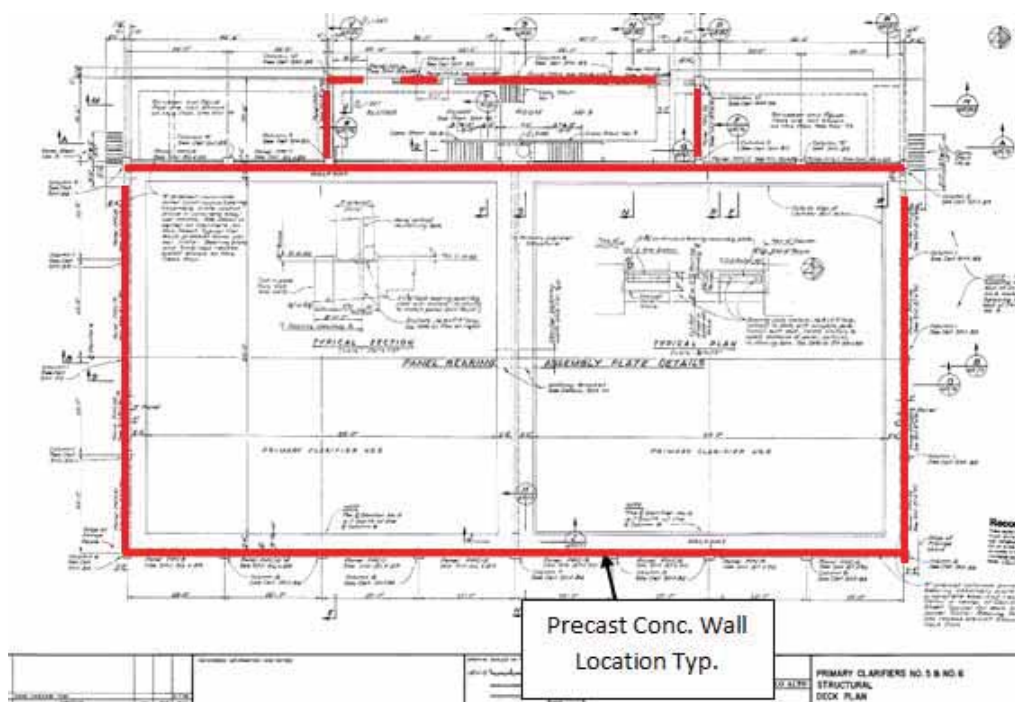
Primary Clarifiers 5-6 Precast Concrete Wall Locations
